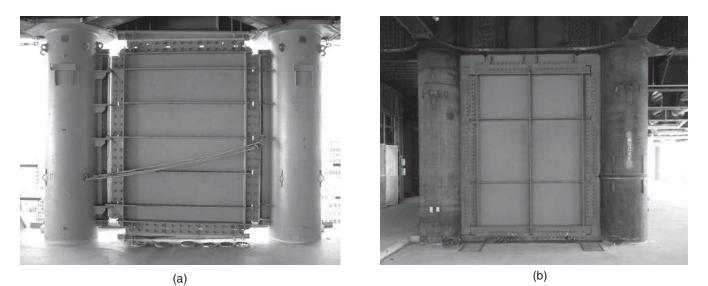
SPW panel in Japan: (a) wall with horizontal panel stiffeners (courtesy of Takanaka); (b) wall with horizontal and vertical stiffeners (courtesy of Nippon Steel).
